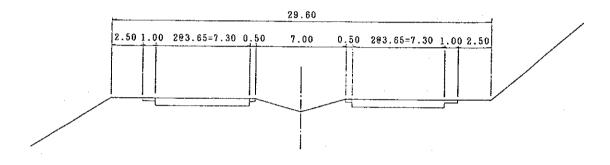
Cross Section of New Road for 30 Mill. Ton/Year
